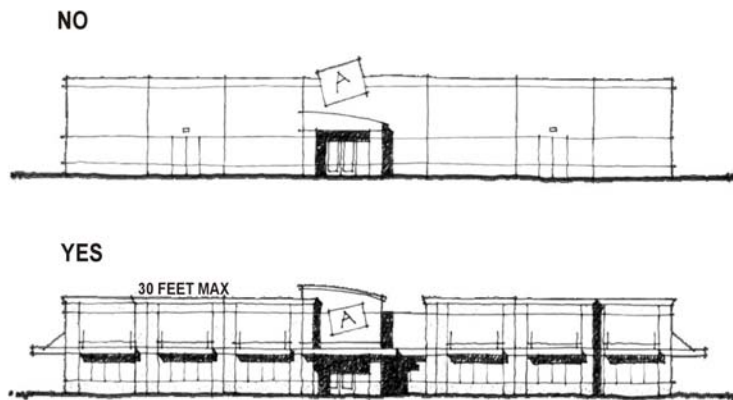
No wall that faces a street or connecting pedestrian walkway shall have a blank, uninterrupted length exceeding thirty (30) feet without including architectural features such as columns, ribs, pilasters or piers, changes in plane, changes in texture or masonry pattern, or an equivalent element that subdivides the wall into human scale proportions.
